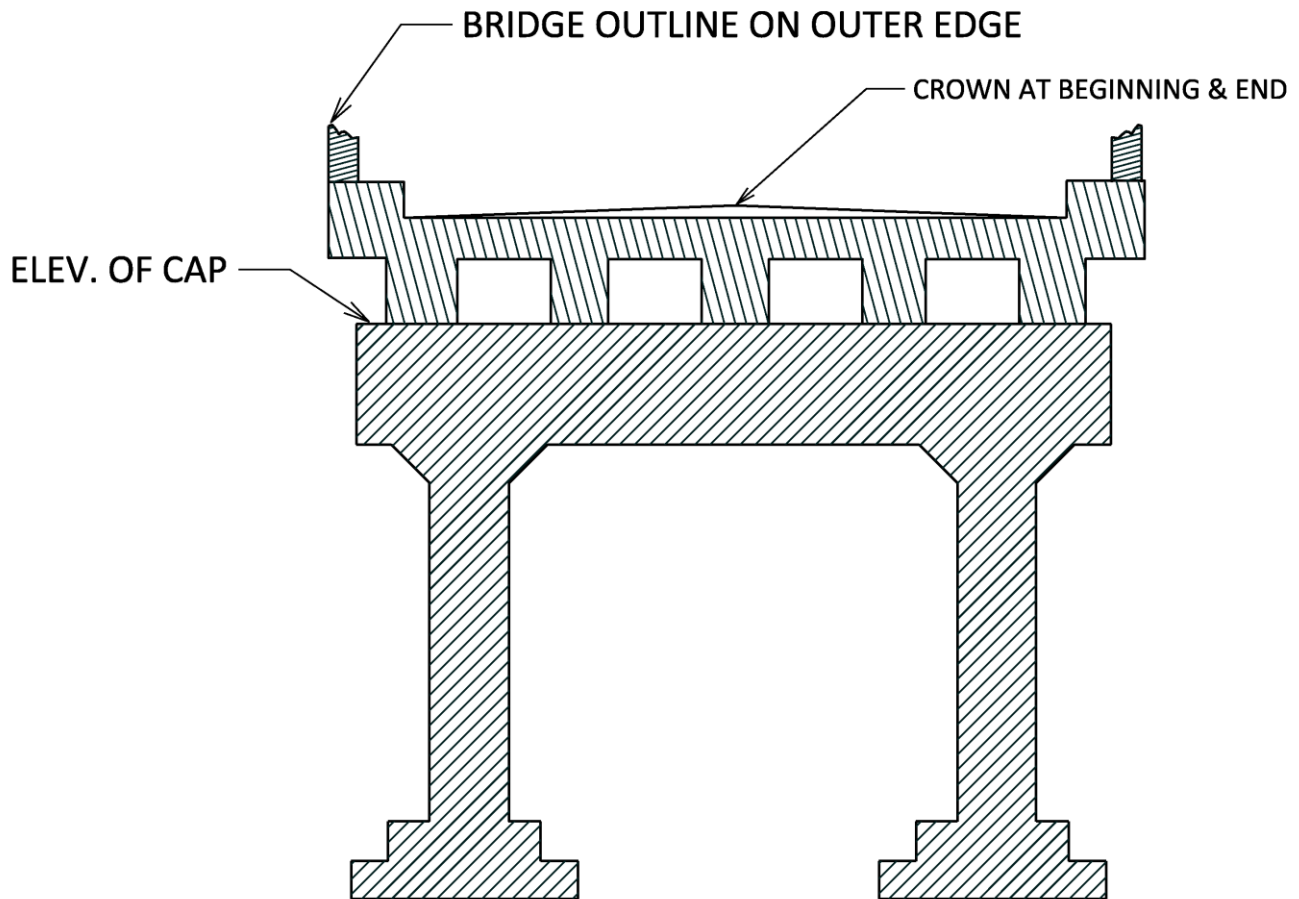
BRIDGE SURVEY DETAIL – CROSS SECTION VIEW
